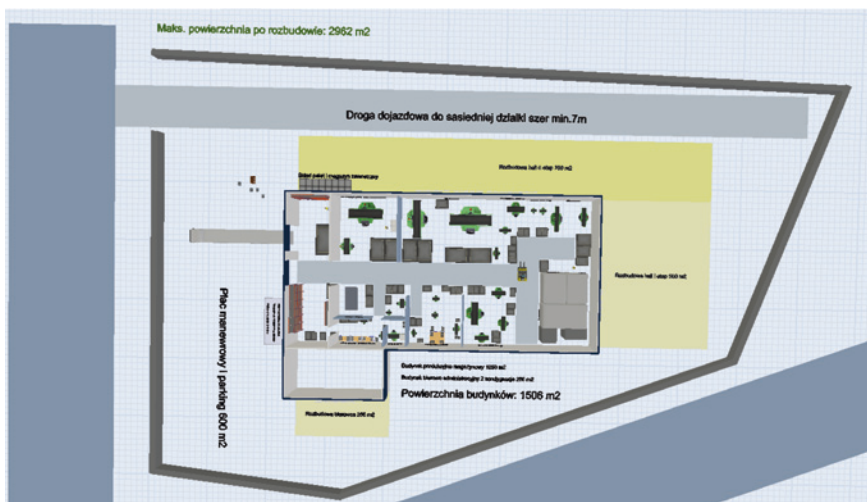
General view on building arrangements and organization of manufacturing lines inside (Source own study)
